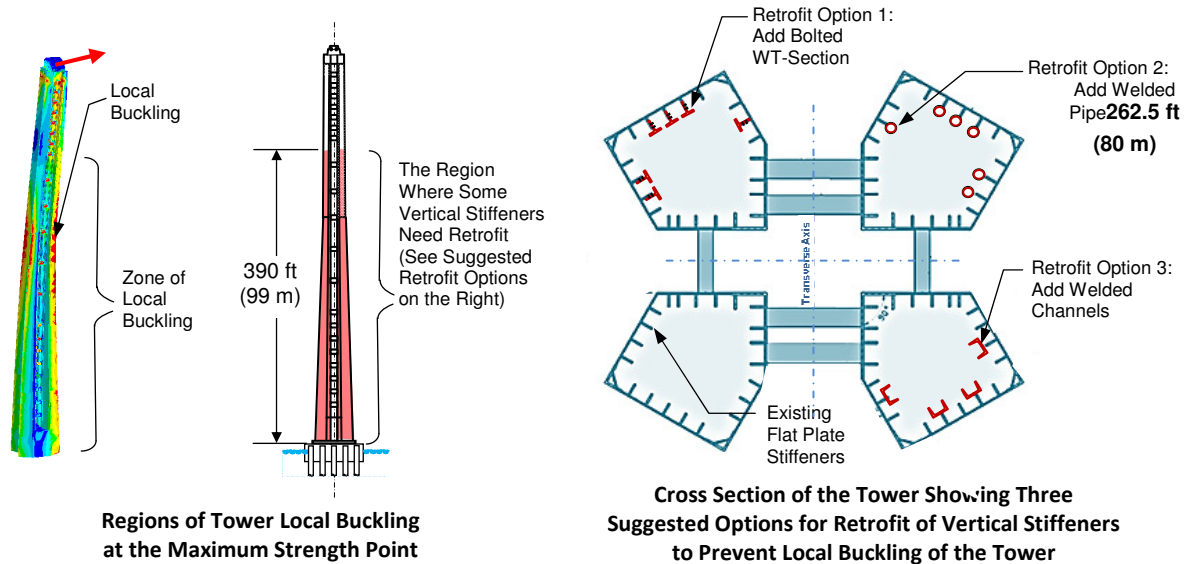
Suggested Retrofit for Vertical Stiffeners of the SAS Bay Bridge to Prevent Local Buckling of the Tower
